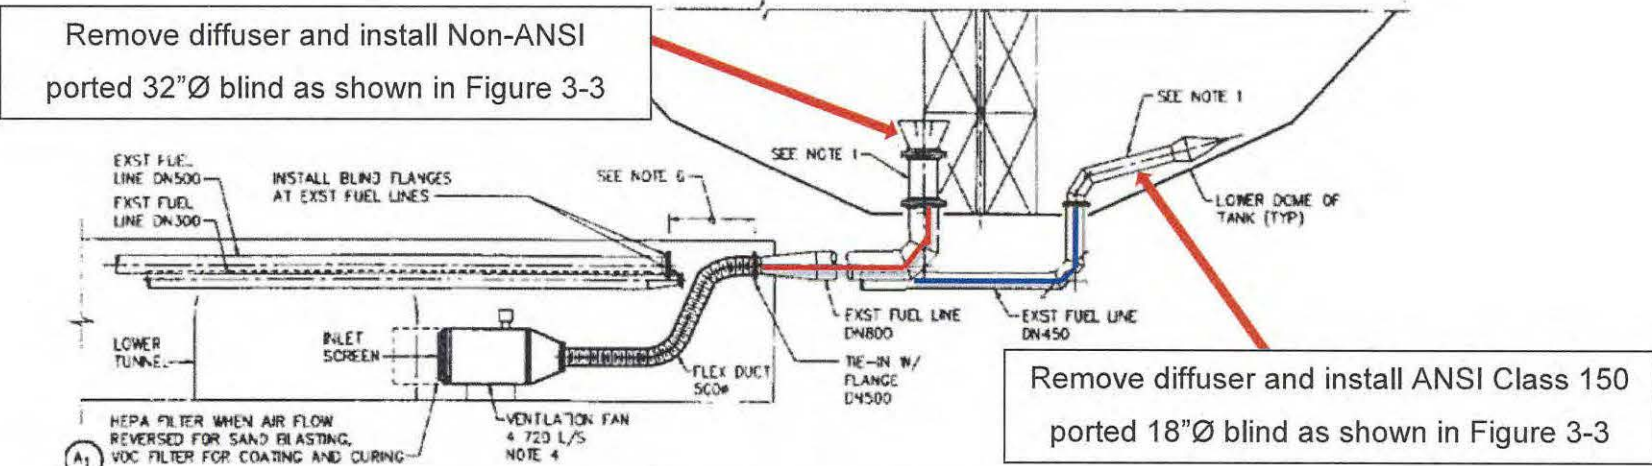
Test Sections at bottom of tank. Blue: 18"Ø JP-8 line / Red: 32"Ø F-76 line.
